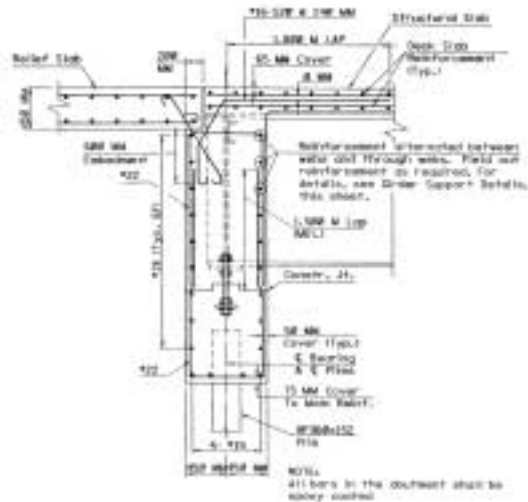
Integral Abutment Detail to be used on Scotch Road Bridge.
